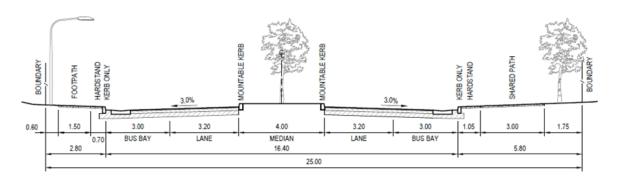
Proposed collector road cross section with 0.7m wide bus bay – The Boulevard
